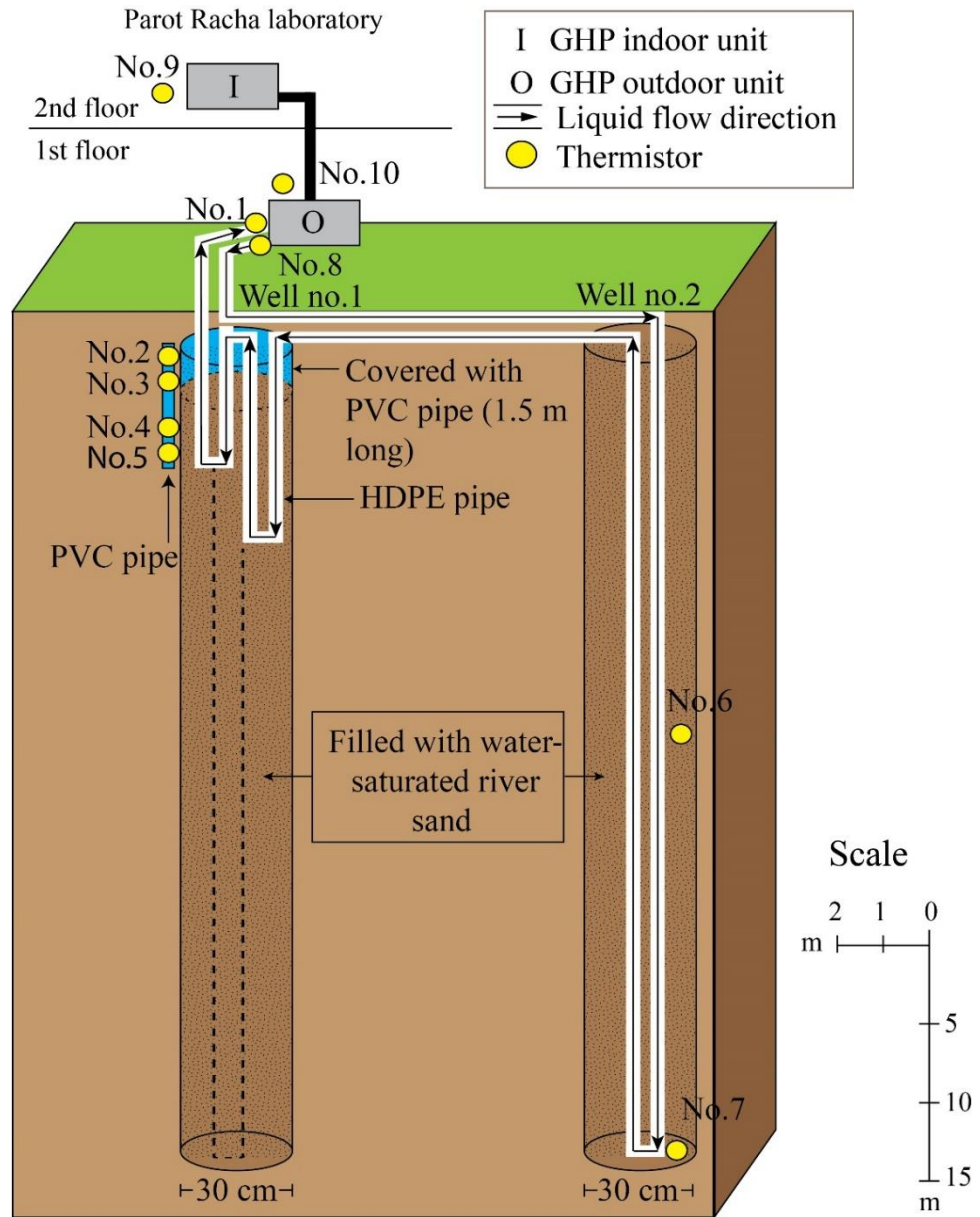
Schematic installation of geothermal heat pump system at Parot Racha laboratory room. Note: HDPE pipe in well no.1 was broken. Therefore two new HDPE pipes with the lengths of 10 and 15 meters were inserted and connected to the well no. 2.
